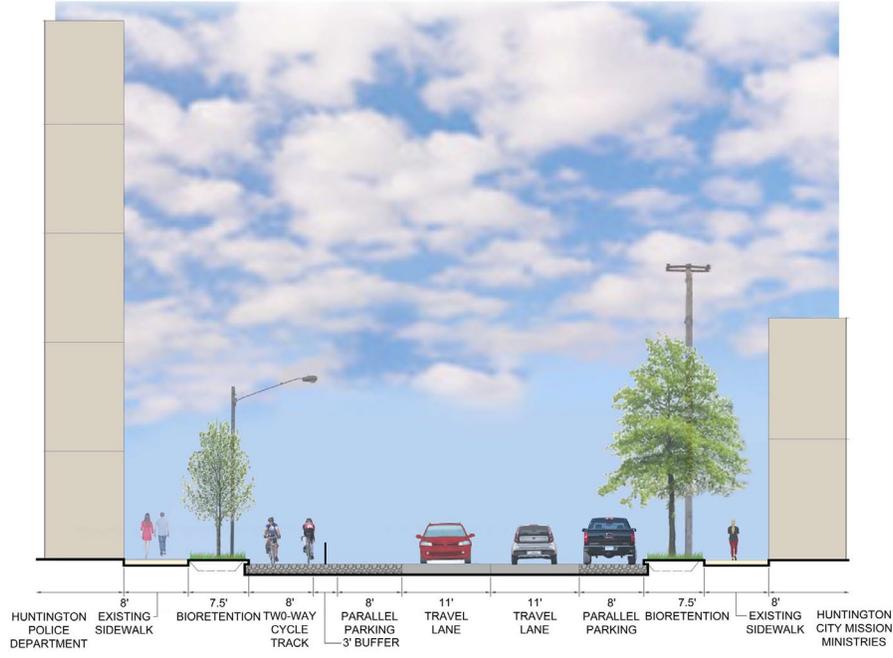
10th Street Underpass (7th Avenue to 5th Avenue)
